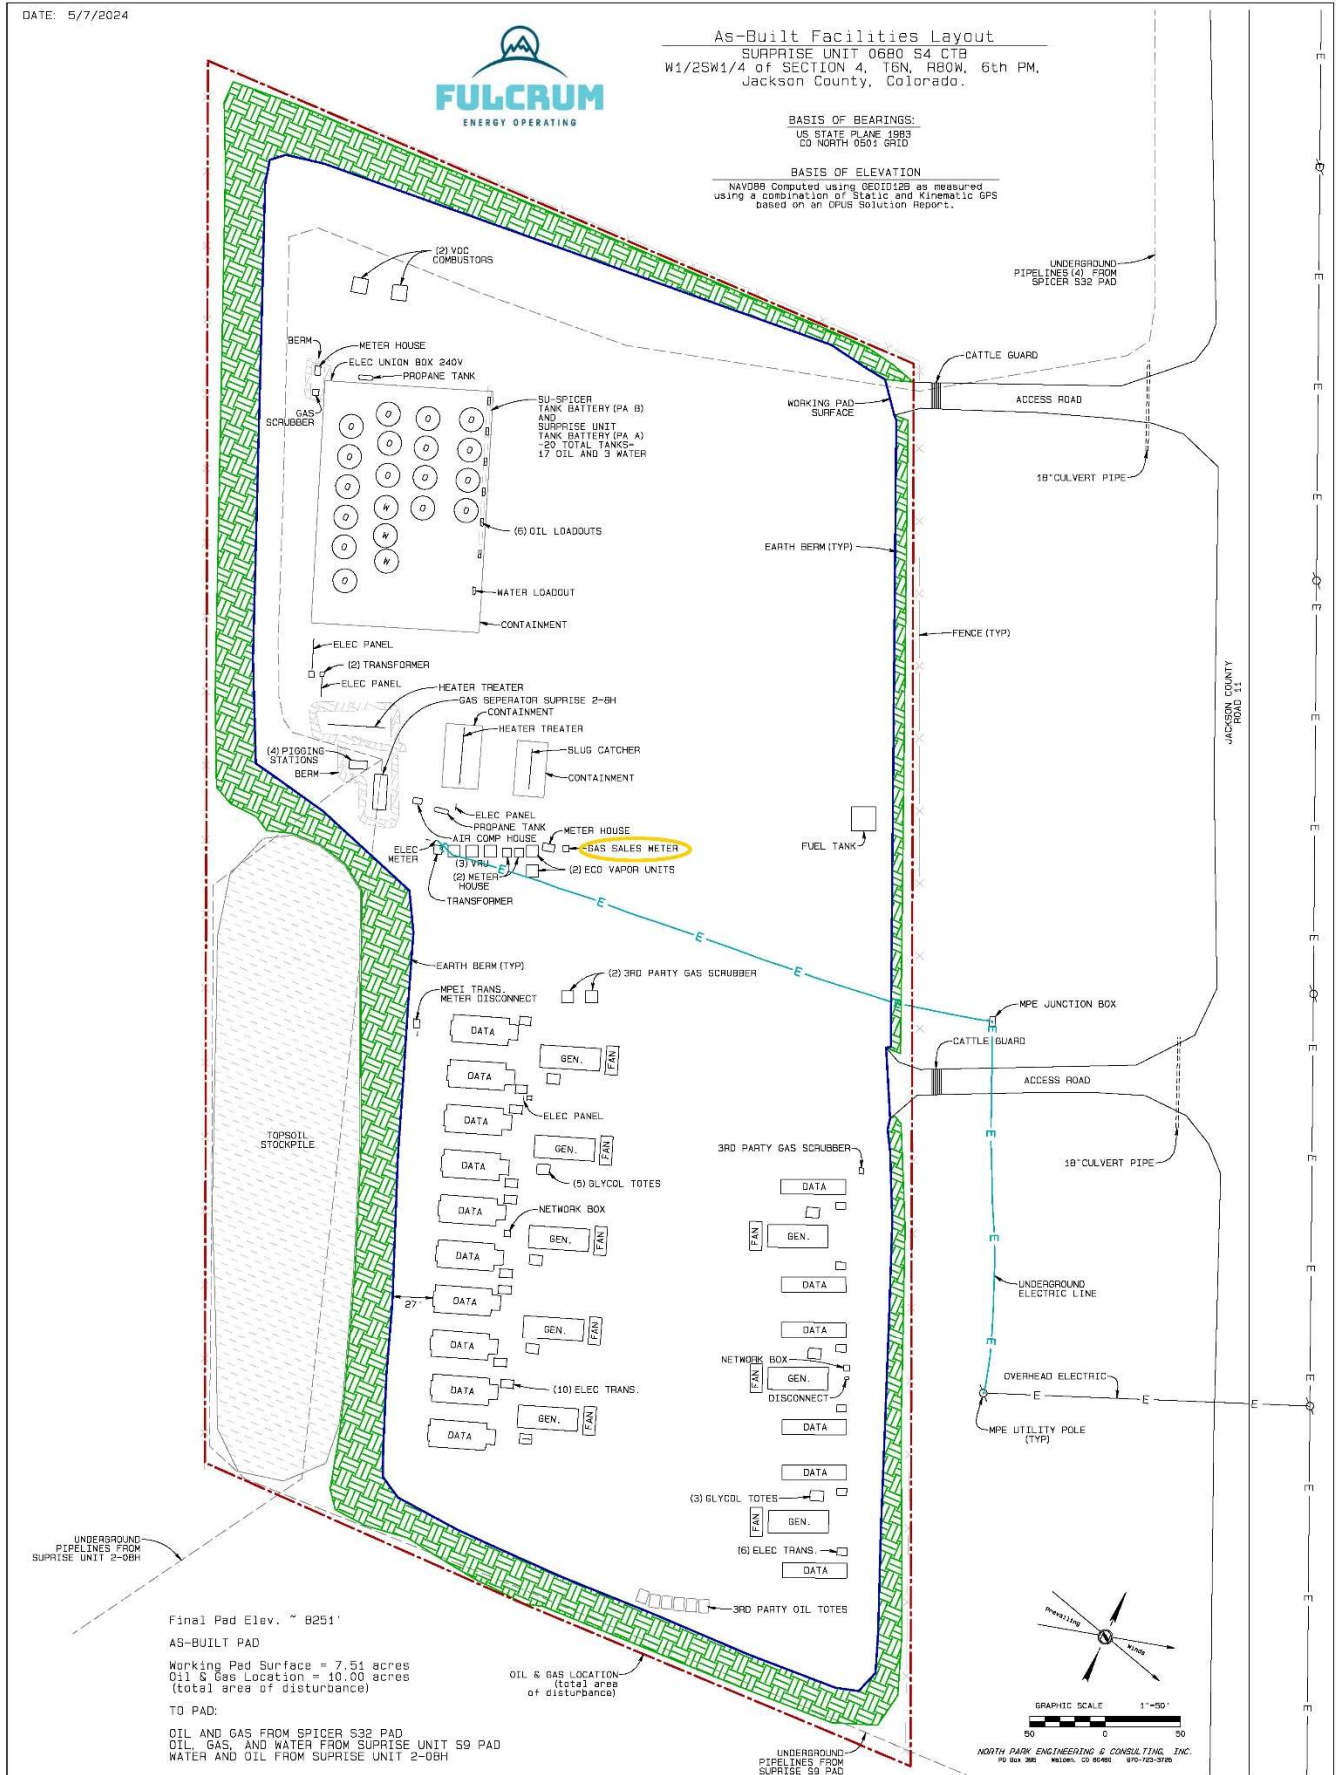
Exhibit H – Surprise Unit 0680 S9 Pad Facility Layout Diagram
